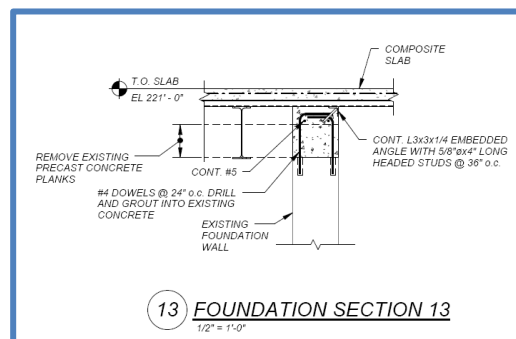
Typical Detail of New Foundation Wall Poured on Top of Existing Foundation
